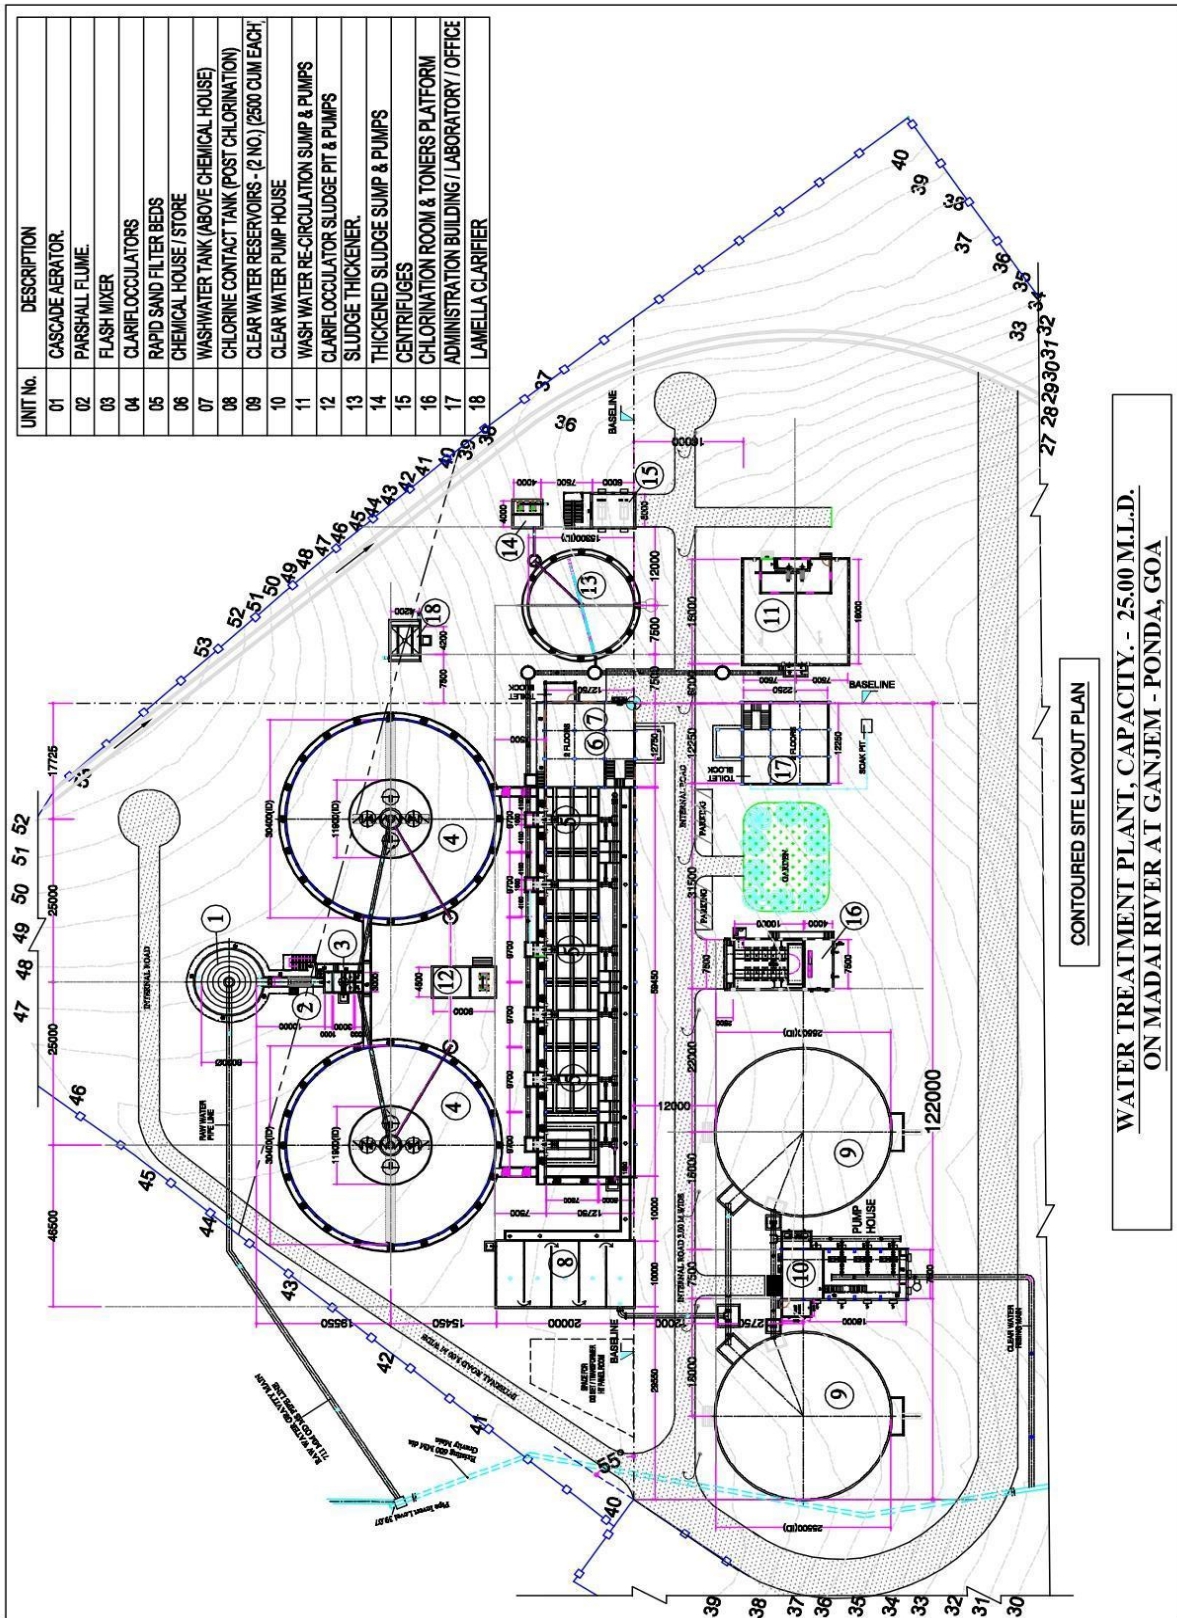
Layout of WTP Capacity 25 MLD at Ganjem, Ponda, Goa
